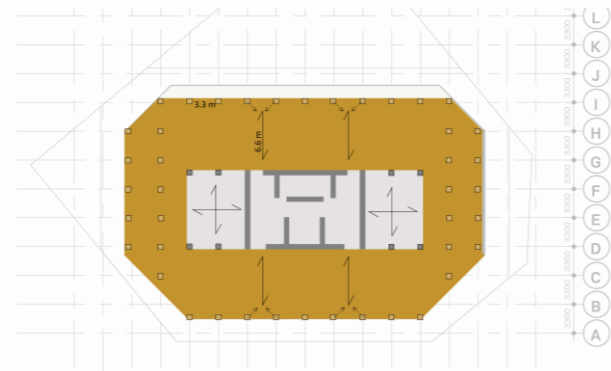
Floorplan timber design variant. Adapted from personal communication R. Crielaard, September 9, 2021.
